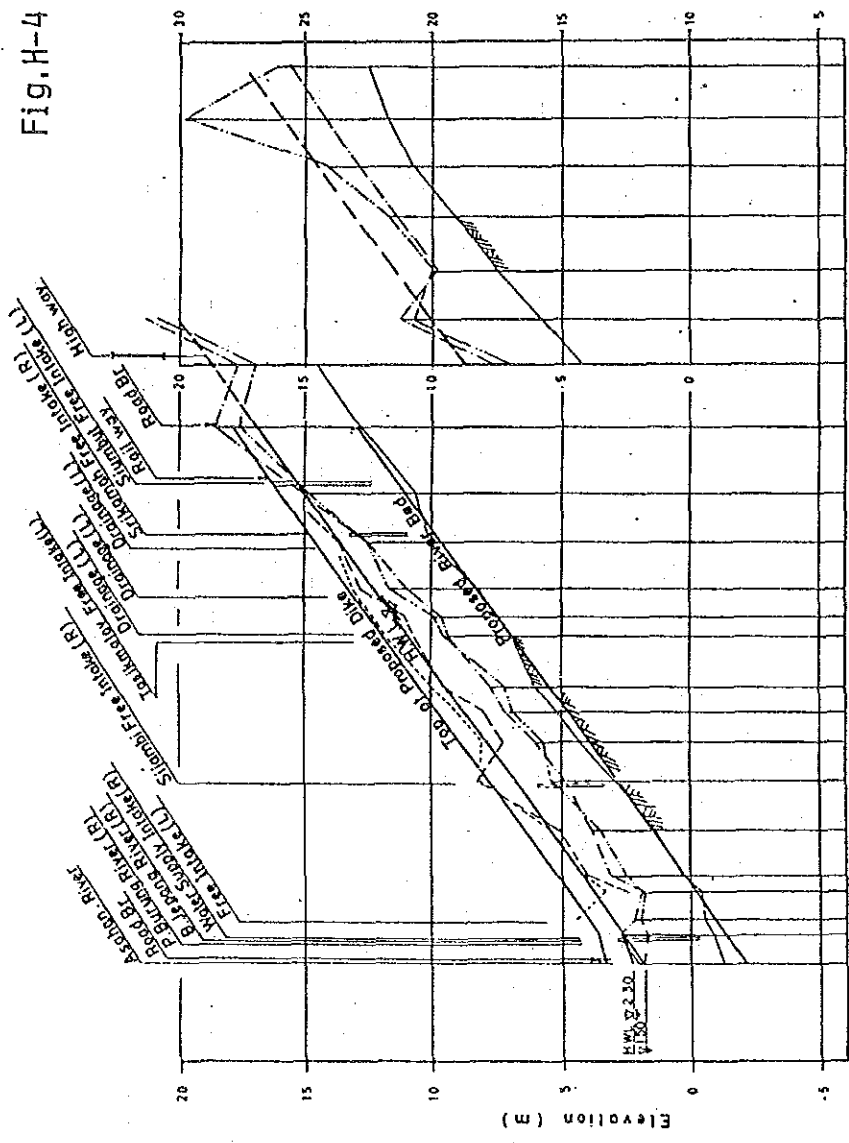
Proposed Long-Term Plan of Aschan AND Silau Rivers (5/6) (Longitudinal Profile of Silau River)
